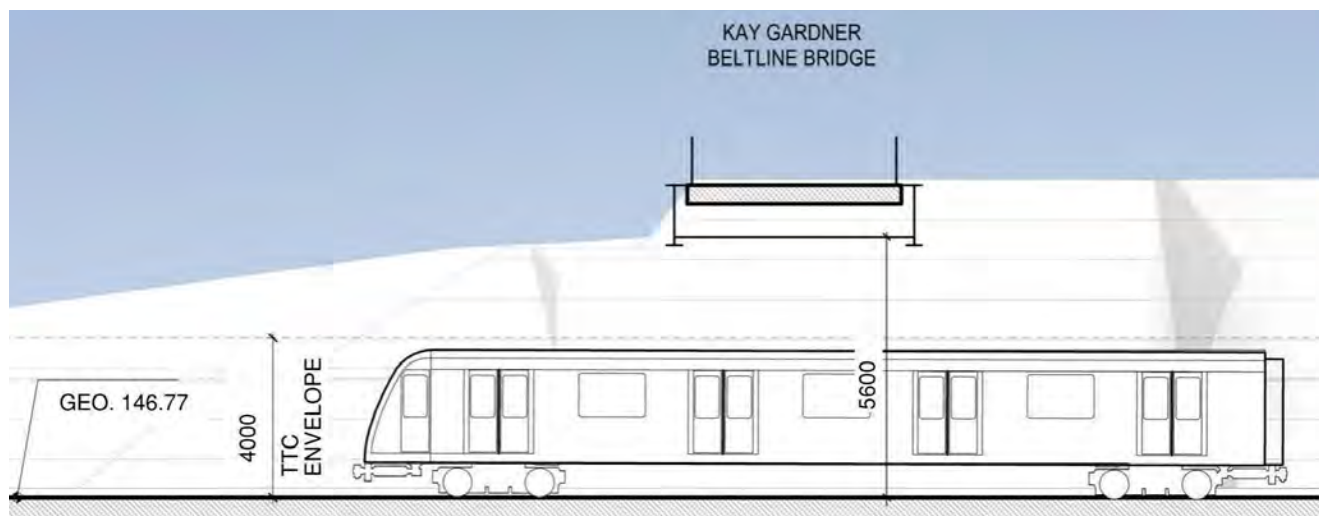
Site section 5- Kay Gardner Beltline Trail Bridge
